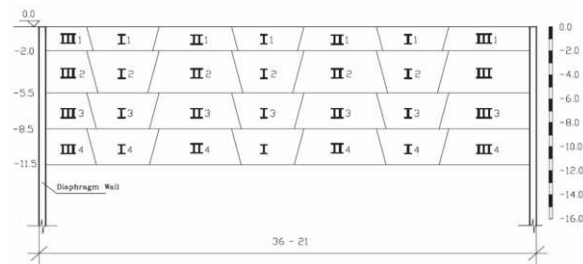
Profile of the construction sequence for the deep excavation at Shanghai New World Commercial City Complex. (Hu et al, 1999)
